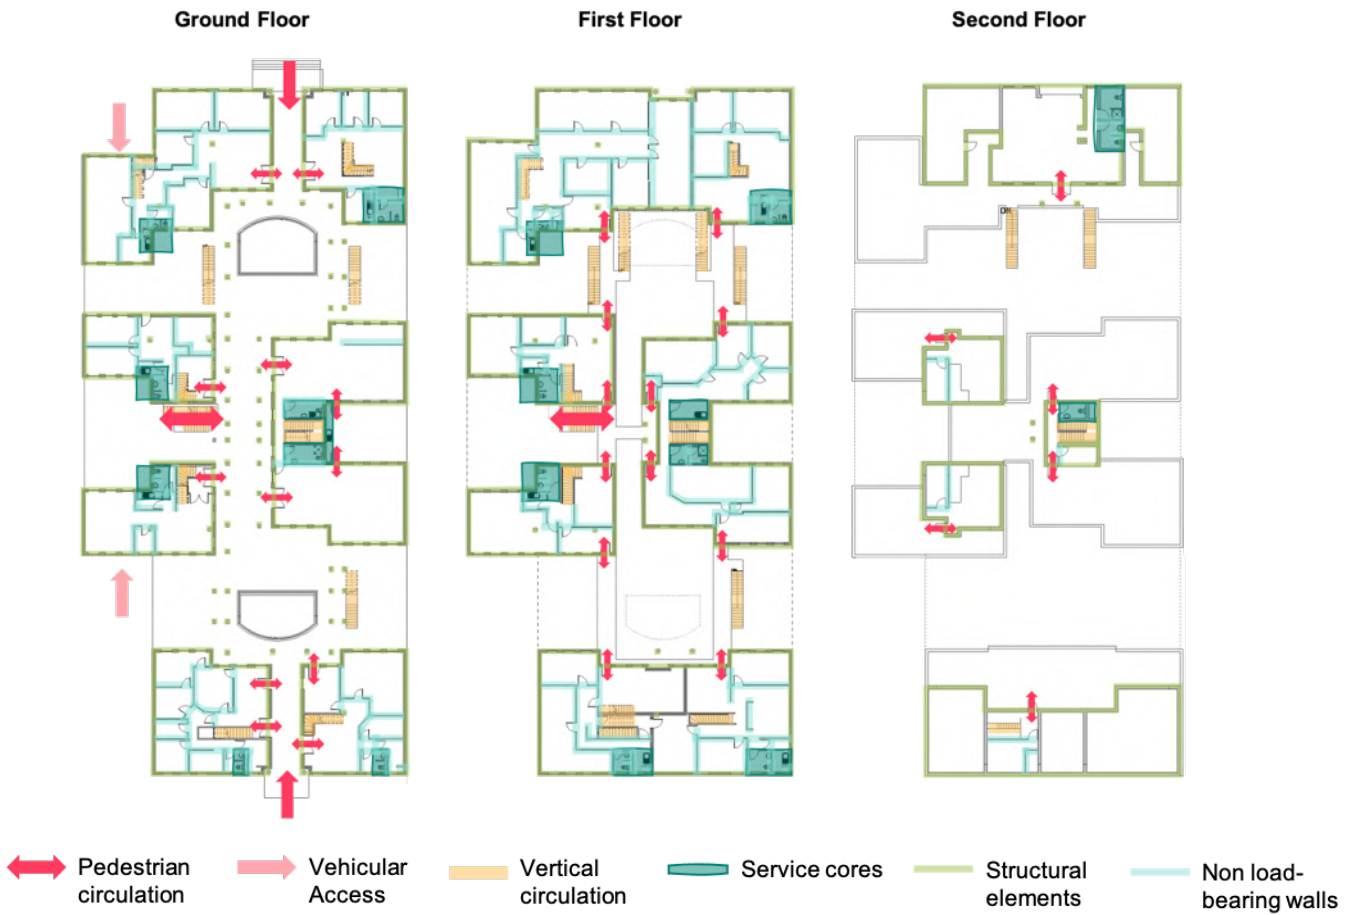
Diagram illustrating existing layout of GF, 1F and 2F highlighting entrances, circulation, service cores and structural elements (Author, 2021).
